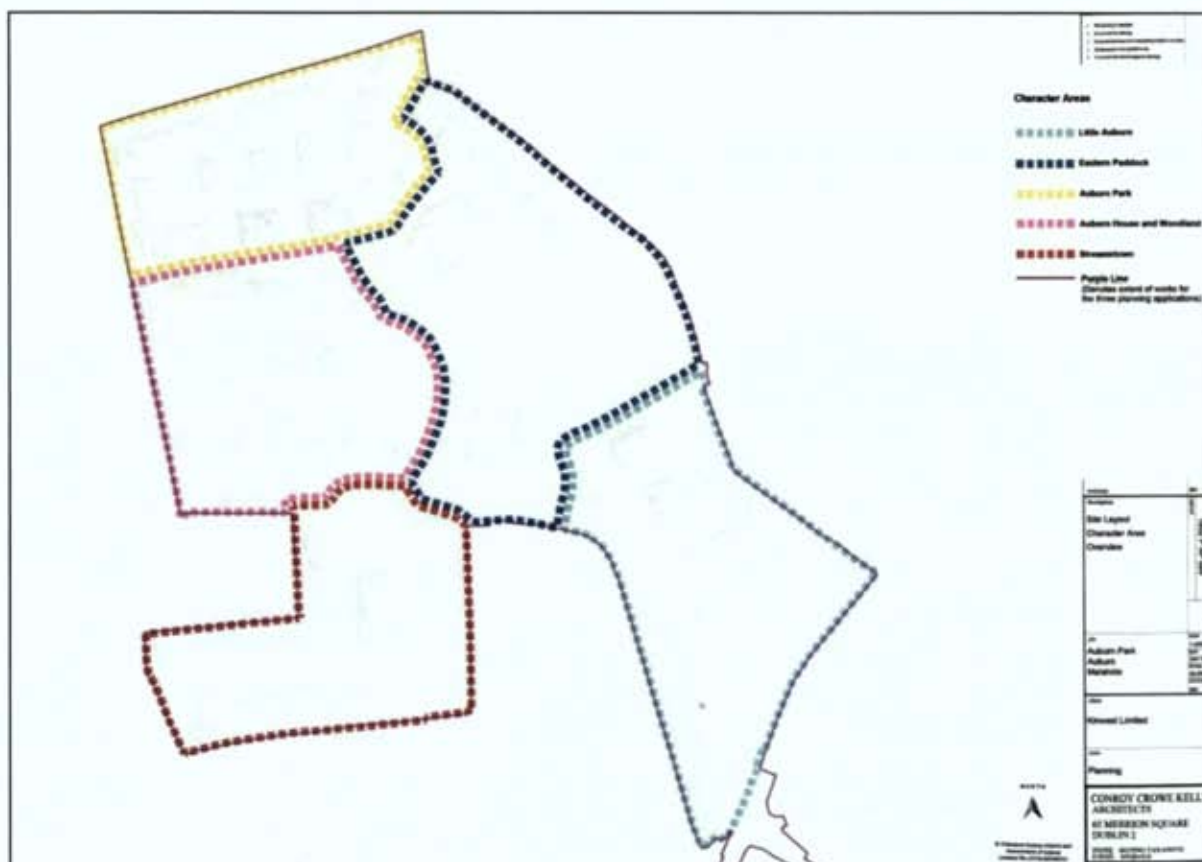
Proposed Character Areas (Source: CCK Architects)
